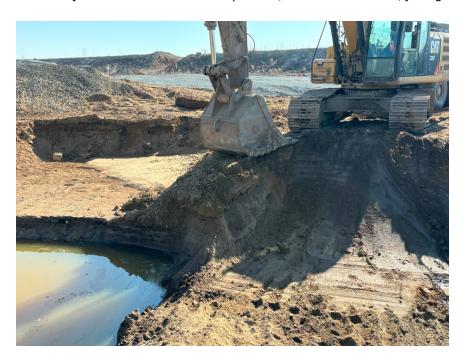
View of Excavation 11 sidewall expansion, IRM 1 Central Area, facing east.
